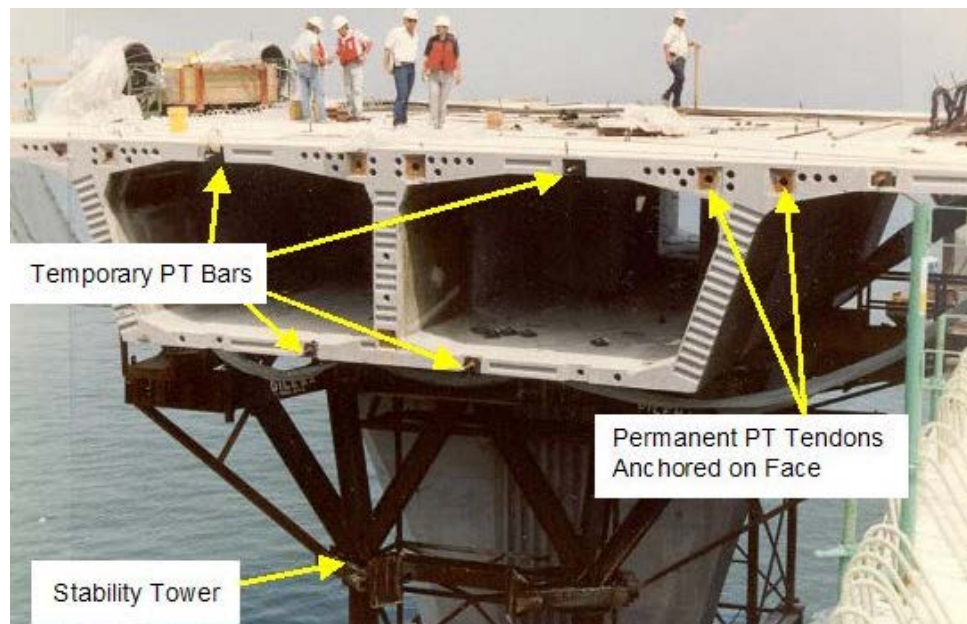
Box Girder Segment During Construction with Temporary and Permanent Post-Tensioning (PT) Bars.
